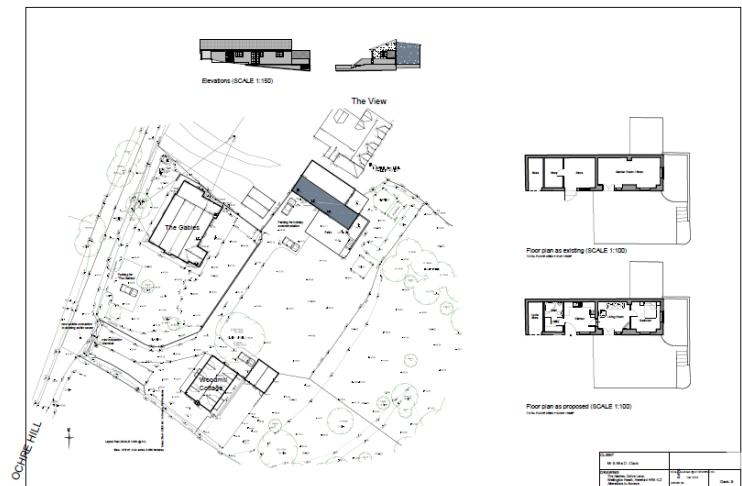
Site Plan indicating existing and proposed floor plans, elevations and layout
